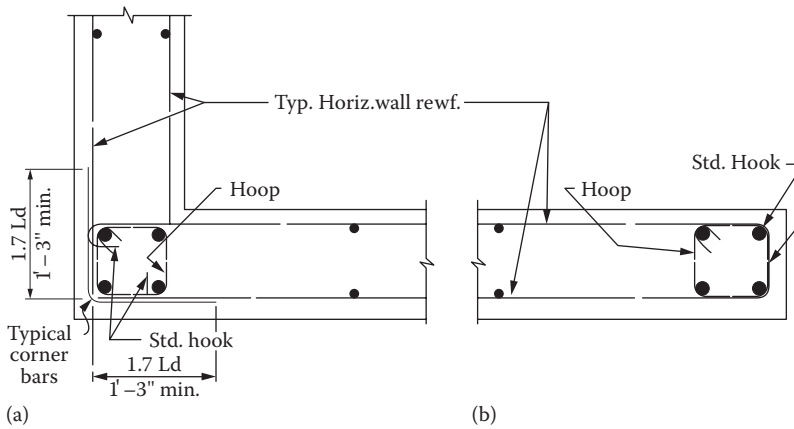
(a) Concrete wall intersection. (b) JAMB.
